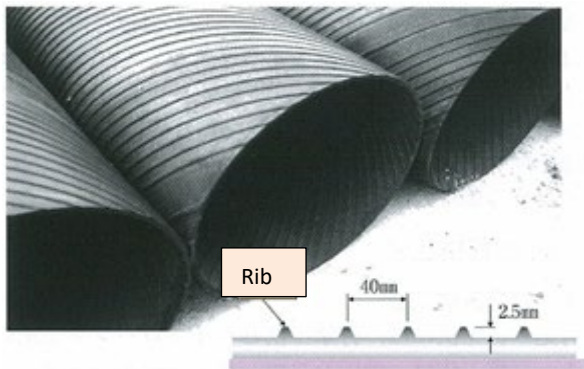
Steel pipe with outside protrusions (ribs)<sup>21)</sup>
